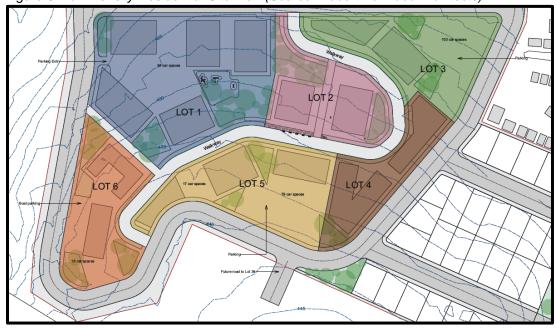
Mixed–Use Precinct Site Plan (Source: Robert Harwood Architects)
